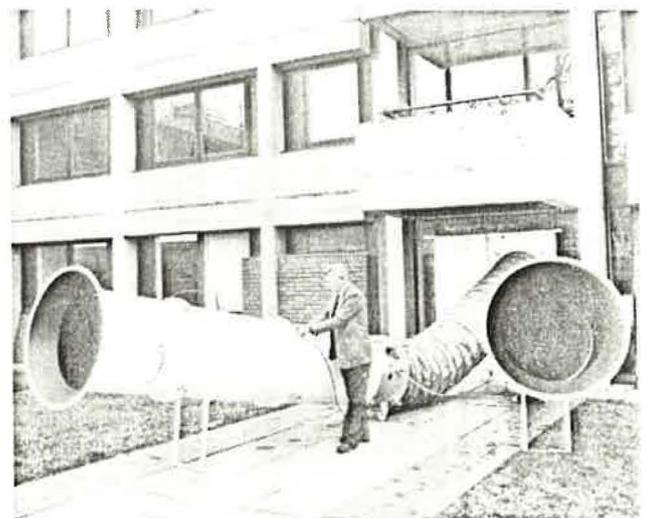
Two BREFAN fan pressurisation units installed in an external doorway of an office building
